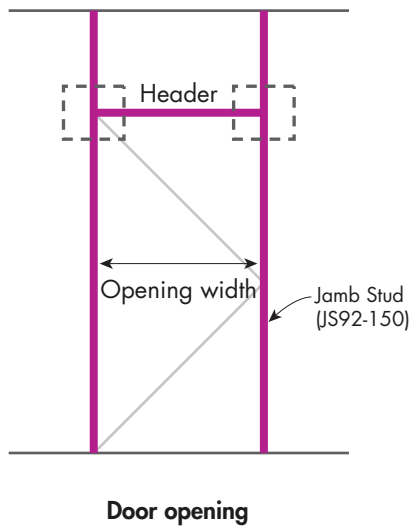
Header to Jamb Stud Connection With Jamb Stud Connector Bracket Elevation
